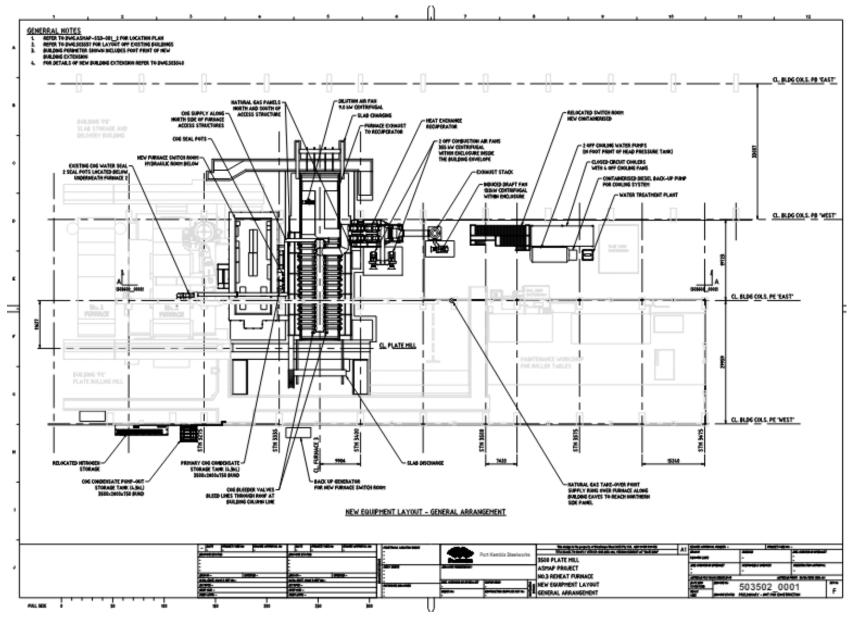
New Walking Beam Furnace – General Arrangement (Drawing #: 503502_0001, Rev F)
